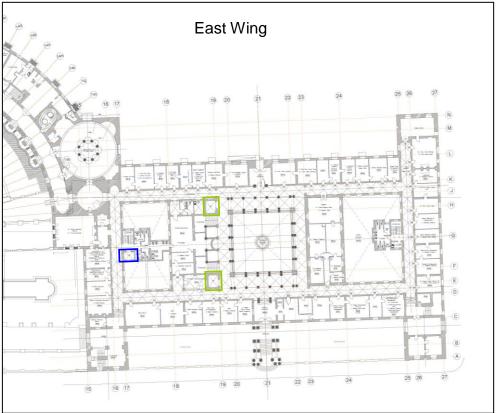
\_Union Buildings\_Overall Ground Floor Plan\_Location of Lifts in East Wing (Source: Drawing Ikemeleng Architects, 2017)
